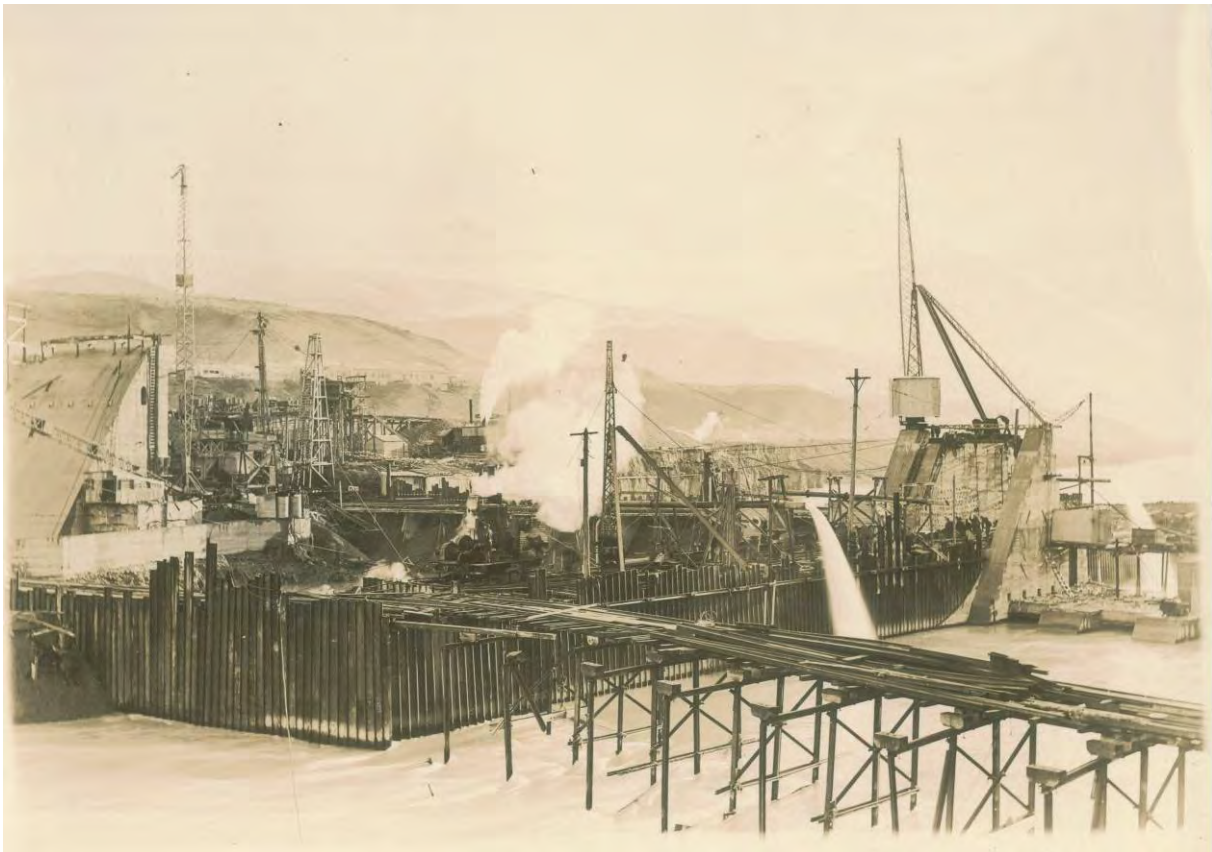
Dewatering Otago coffer dam area showing sheet piling and pumps
